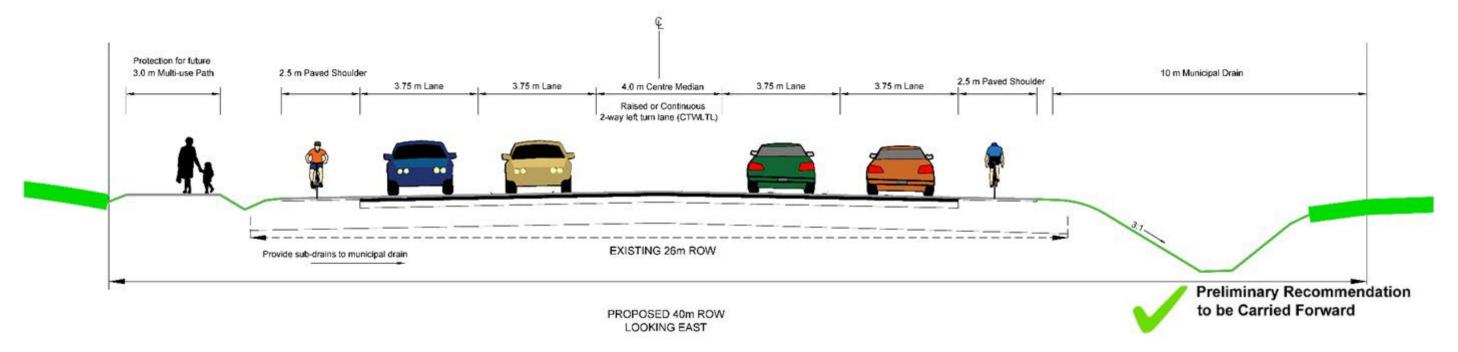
Section 3 Cross Section Technically Preferred Alternative
